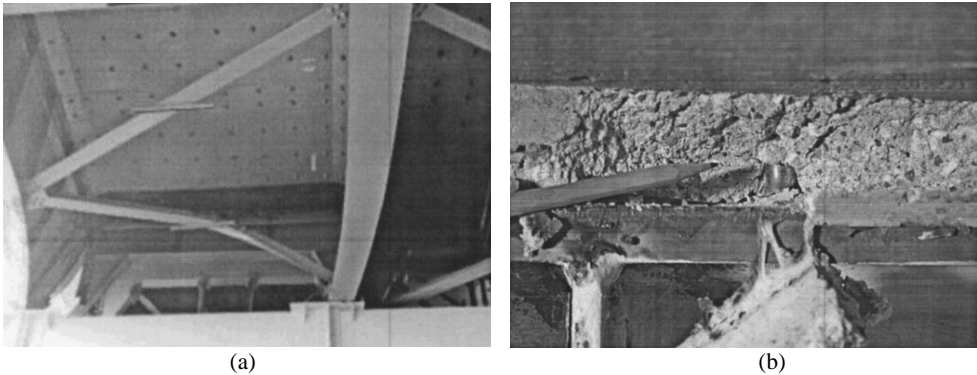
(a) Damage to end cross frames and girders during 1995 Kobe earthquake; (b) failure of shear connectors in bridge model during transverse cycling loading.
